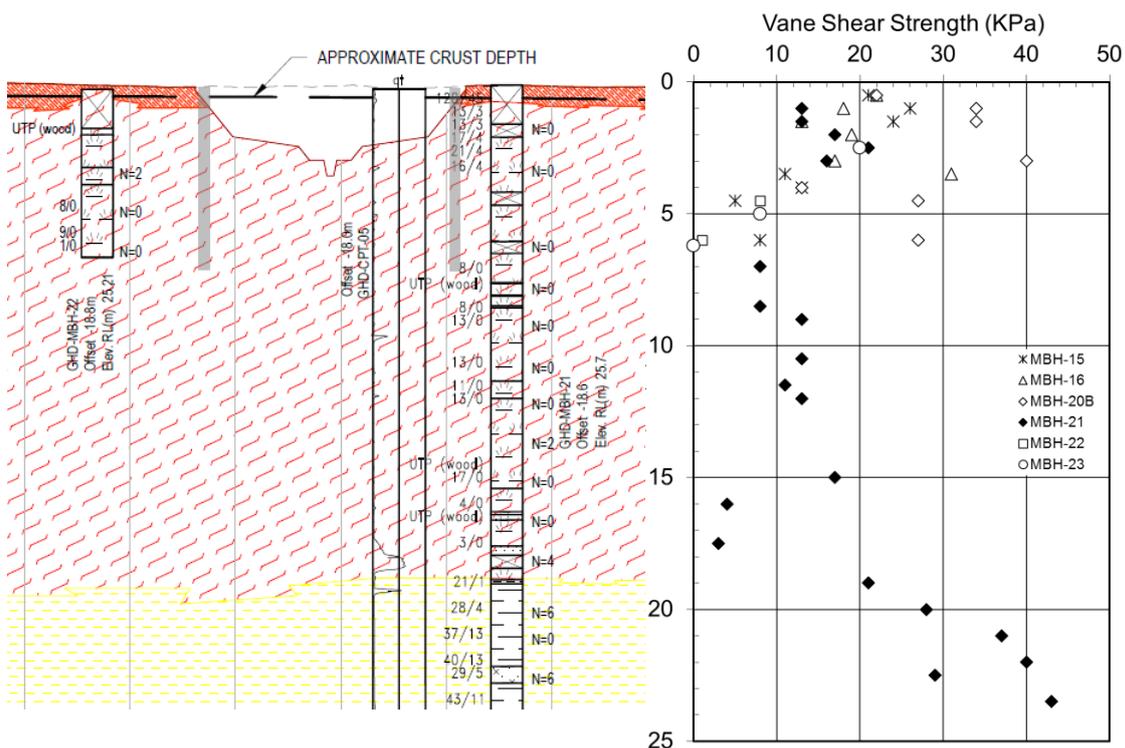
Typical Geotechnical Section and Vane Shear Strength Profile
